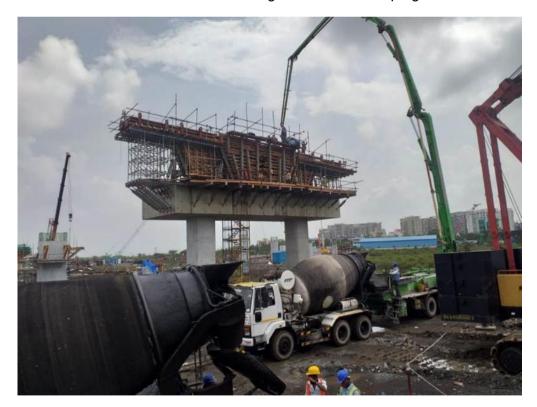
Large Pier head segment concreting at MP 256 RHS in progress
